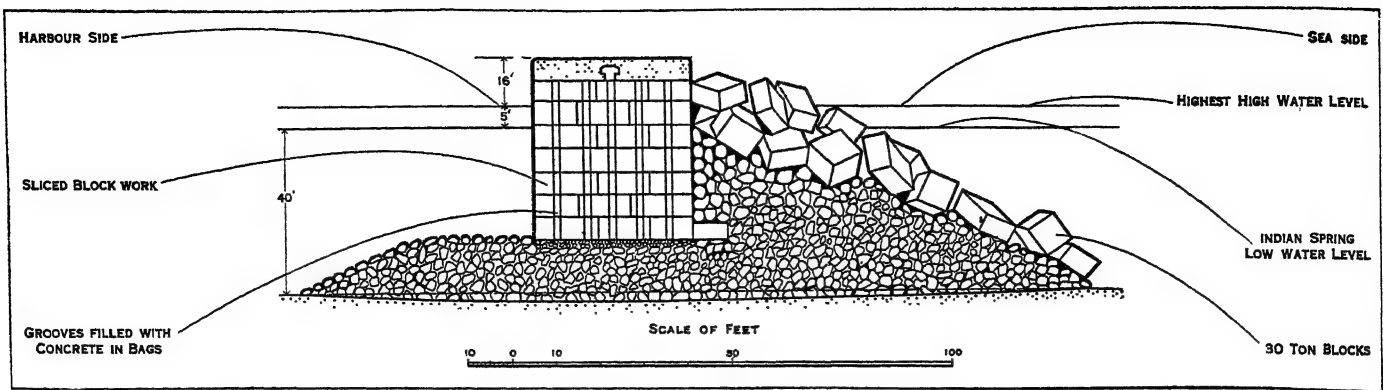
THE MODERN MADRAS BREAKWATERS: CROSS SECTION OF NORTH SHELTERING ARM AND BREAKWATER CLOSING OLD ENTRANCE
